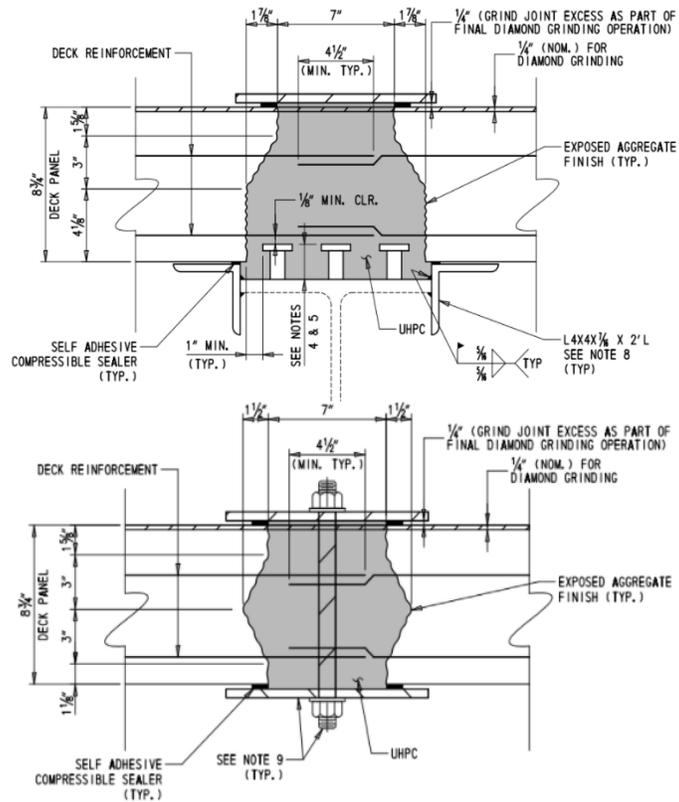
Longitudinal and transverse joint details as presented in BR 1-251 plans.
